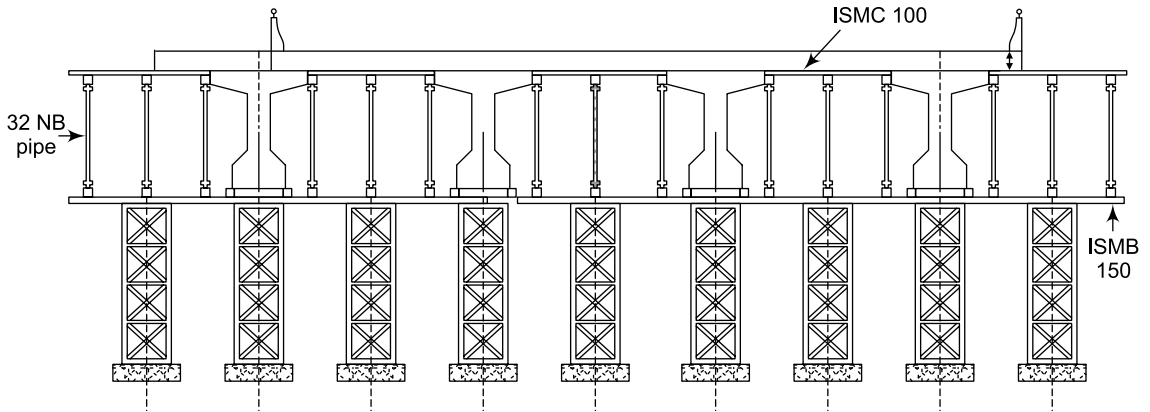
Cross Section of Formwork for Bridge Girders and Slab for a Major Bridge.
